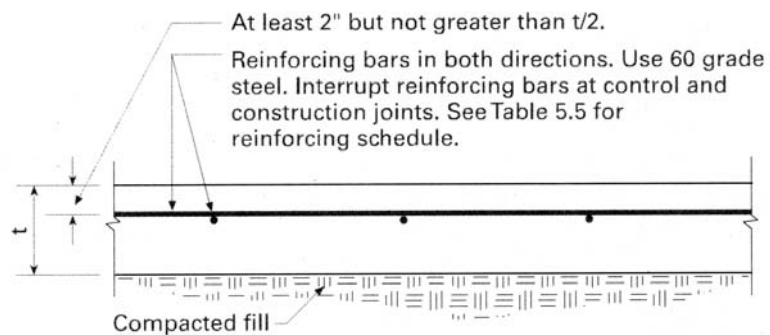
Concrete detail for mixing and loading pad floor with one layer of reinforcing. (See table 5.4 for concrete thickness, t).
